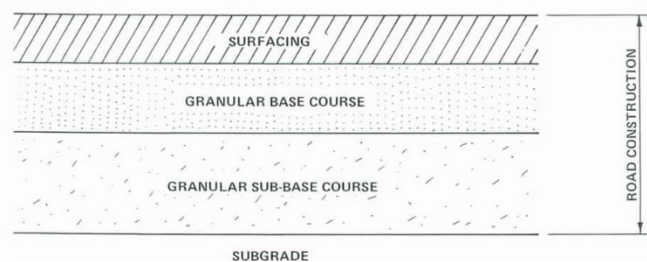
Typical Pavement Structure (Ministry of Transportation Construction Manual)
